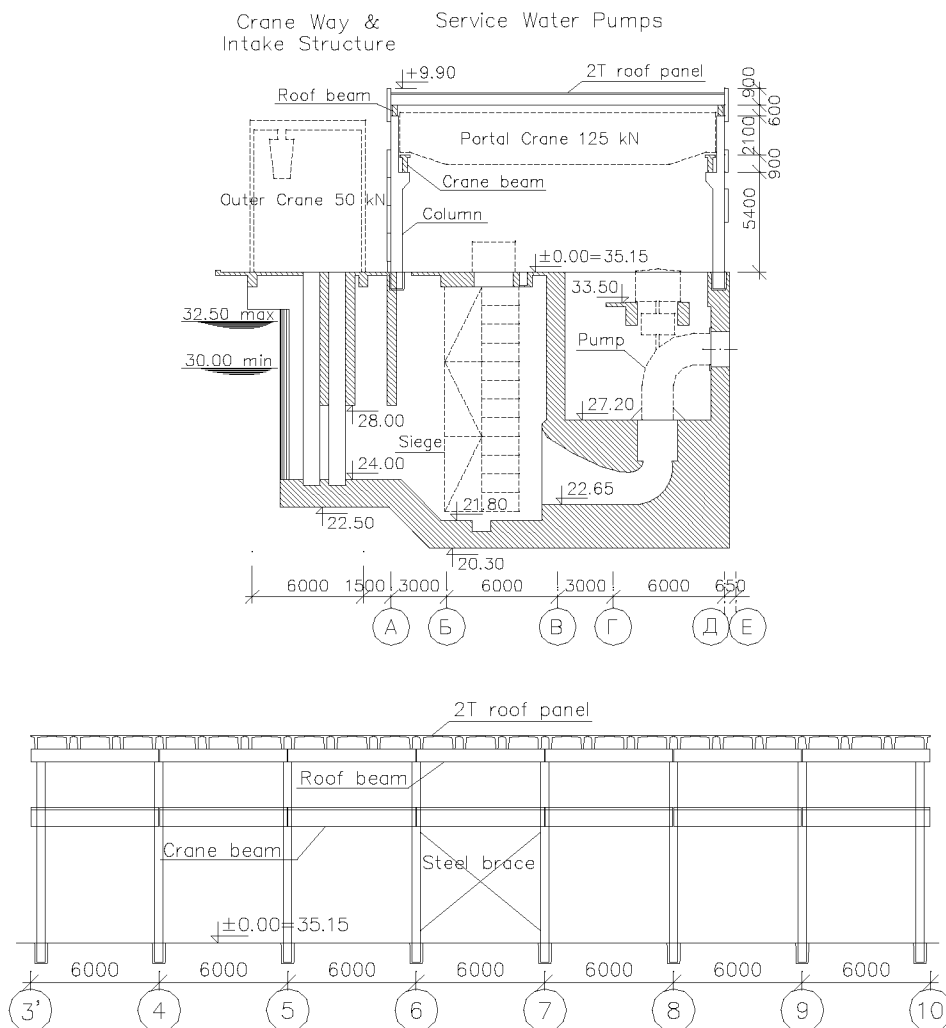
Typical Transverse and Longitudinal Cross-section of SWP structure
